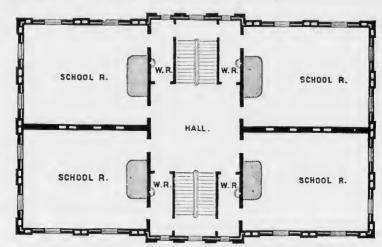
Plan of Second and Third Floors, adapted to Fig. 189.
